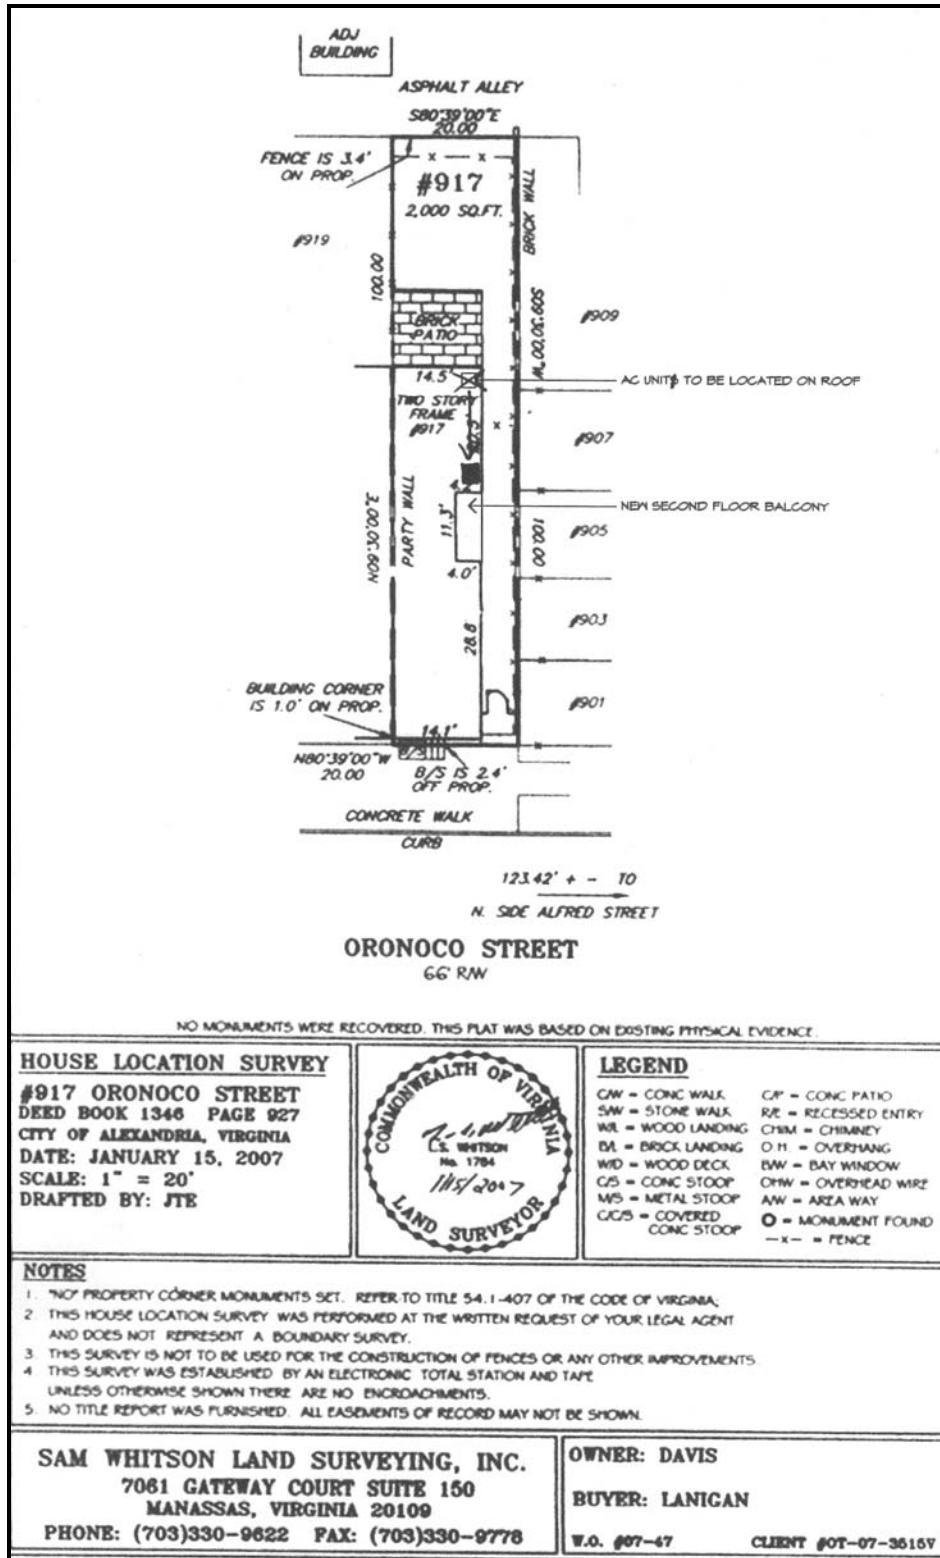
Site plan showing balcony location and rooftop HVAC unit
